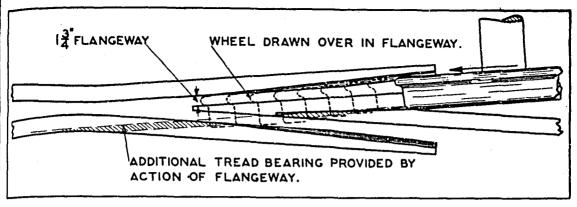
WHEEL DRAWN OVER BY FLARED GUARD WING.
